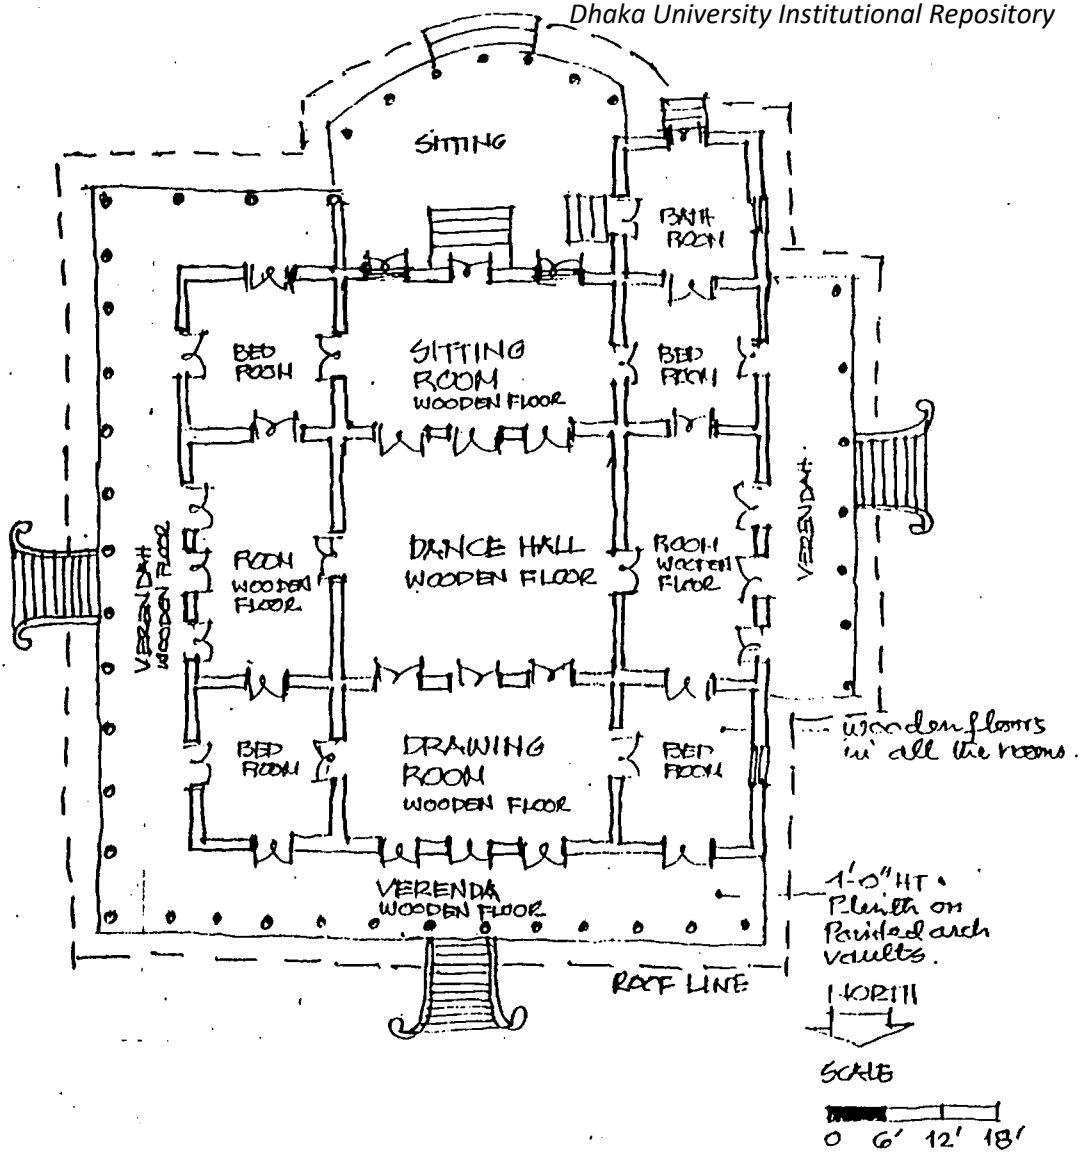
Ground floor plan, bagan bari, Zamindar of Tapa Rangpur
